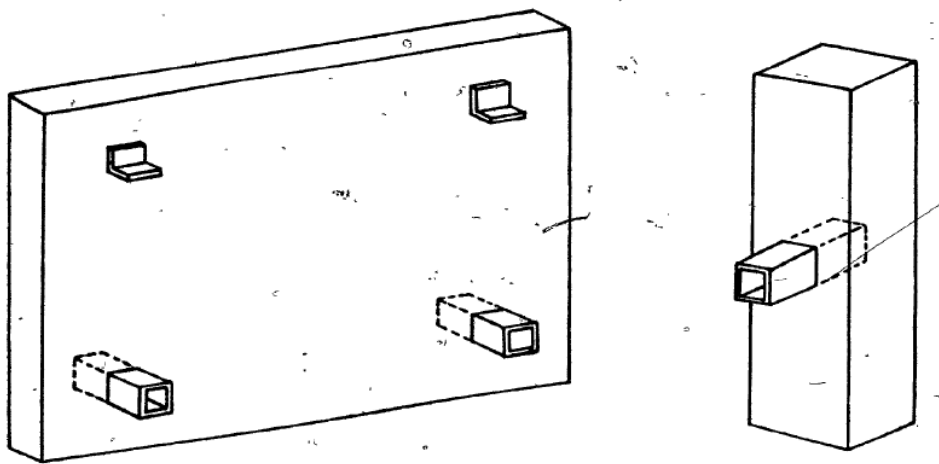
Typical Wall Panel and Beam-to-Column Composite Connections (Marcakis and Mitchell 1980)
